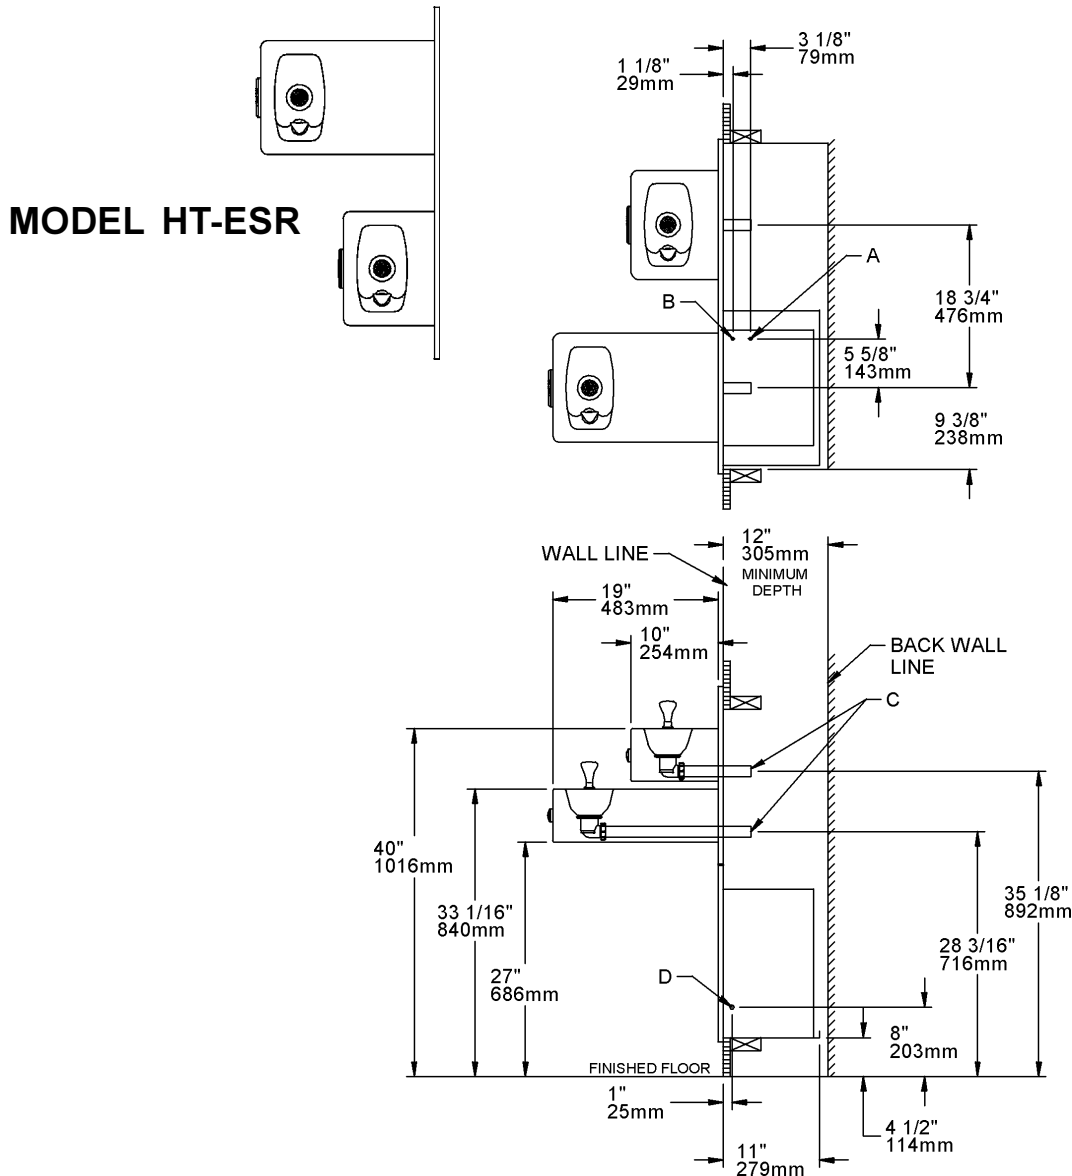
Rough-In Assembly Dual-Station Mounting Frames
